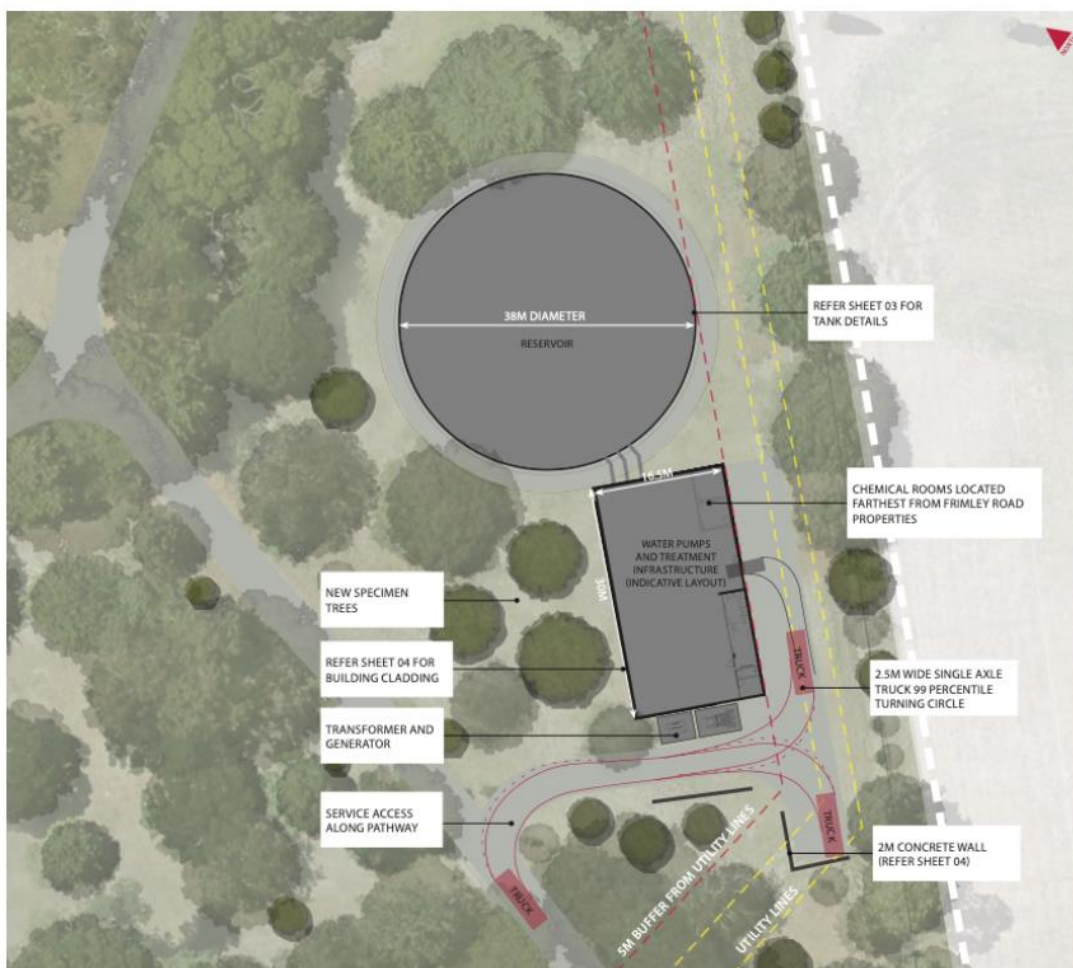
Proposed Site Plan (Prepared by Wayfinder, Not to Scale)
